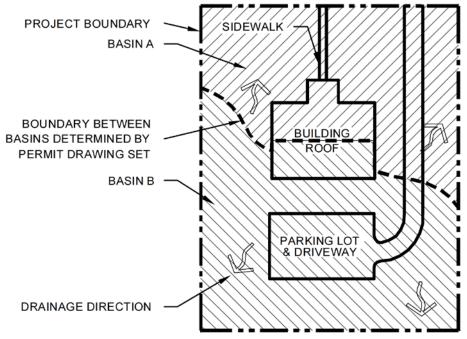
This is an example of a typical development with two basins, Basin A and Basin B, separated by a ridge created by the final grading plan and the roof slope and downspout design. (BMPs not shown.) This project would use two LID Implementation Forms (see "Completing the LID Implementation Form (Overview & Example)" below).
